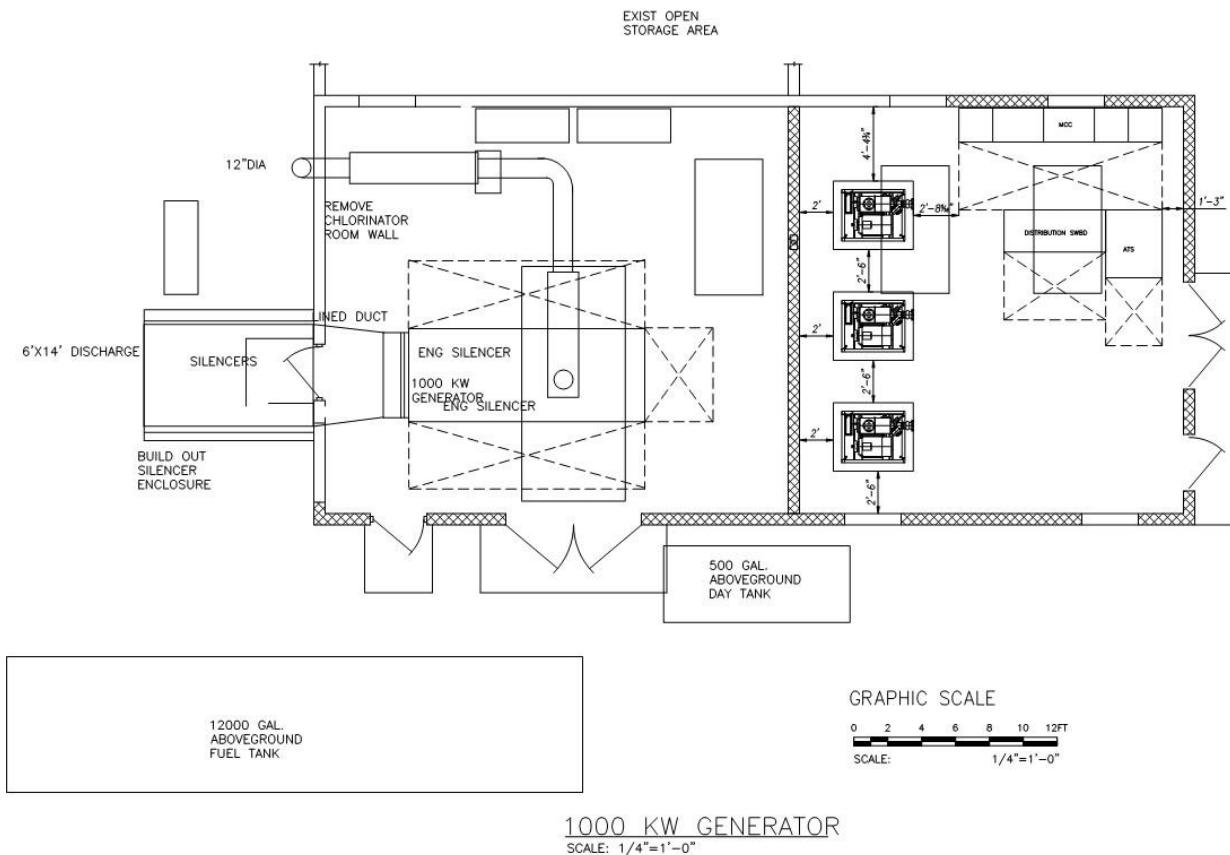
1,000 KW Generator Building Floor Plan
